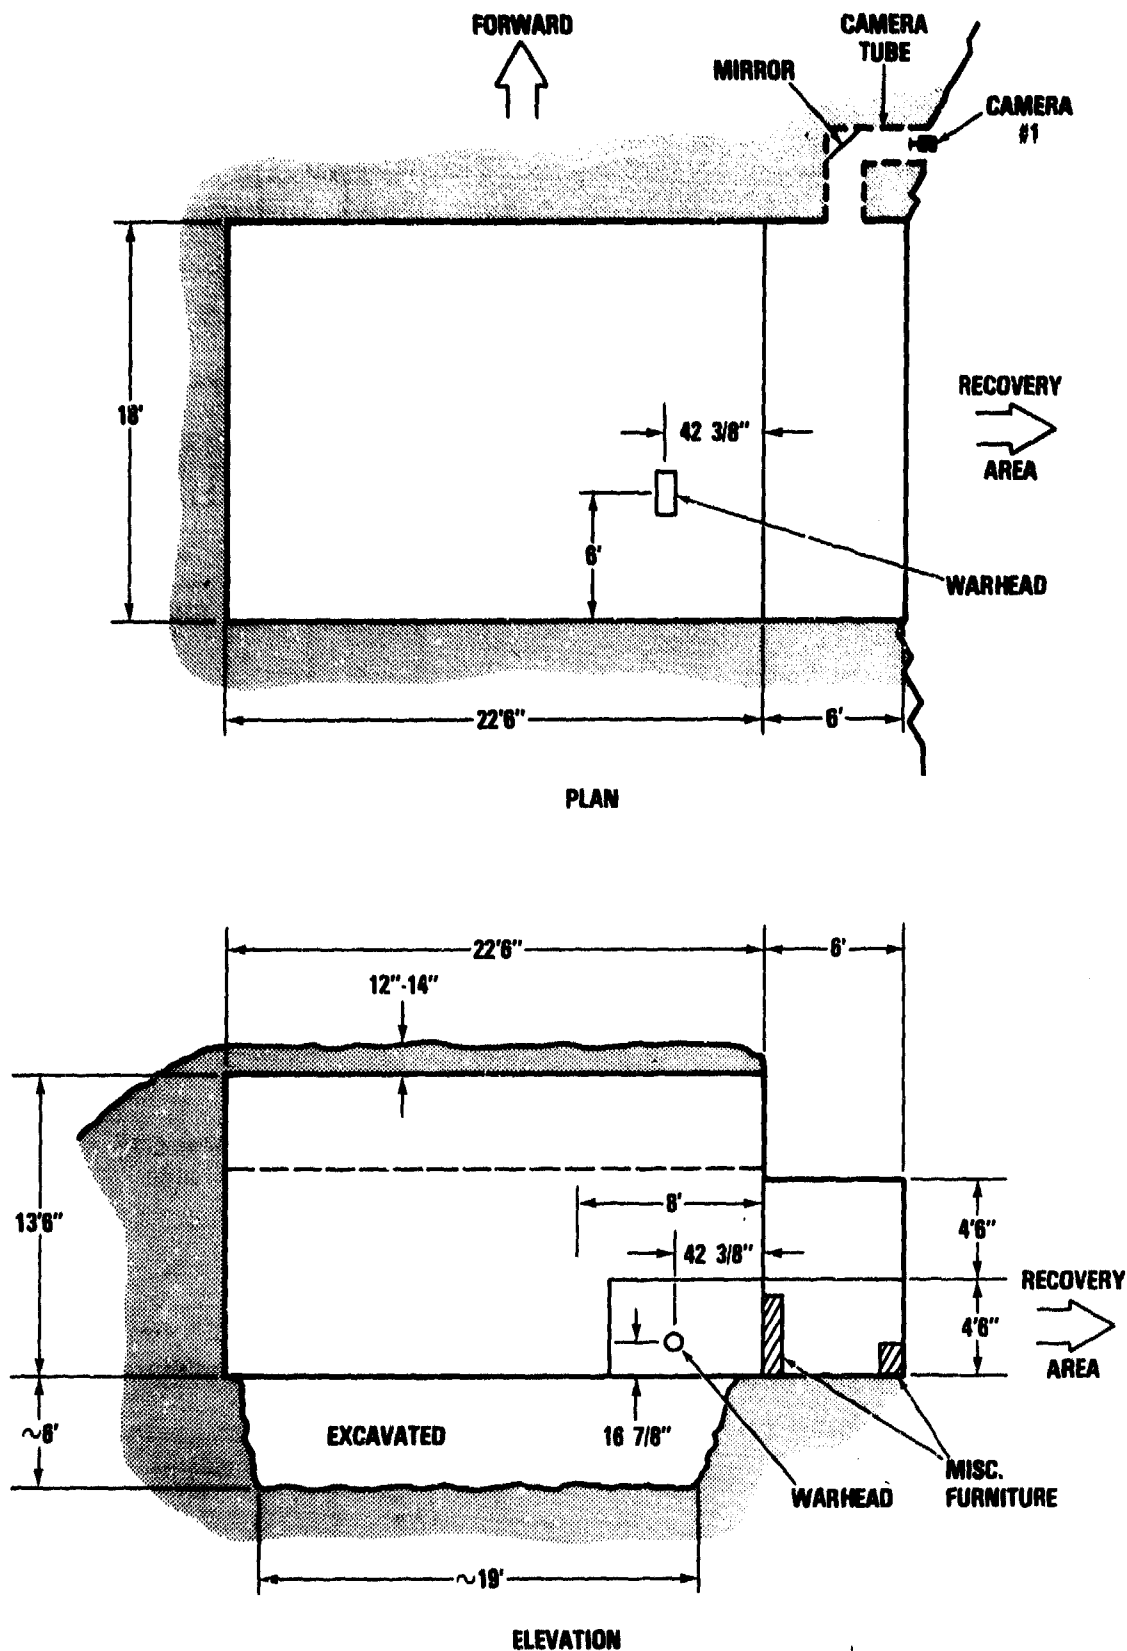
MODEL CONSTRUCTION FIRST TEST
